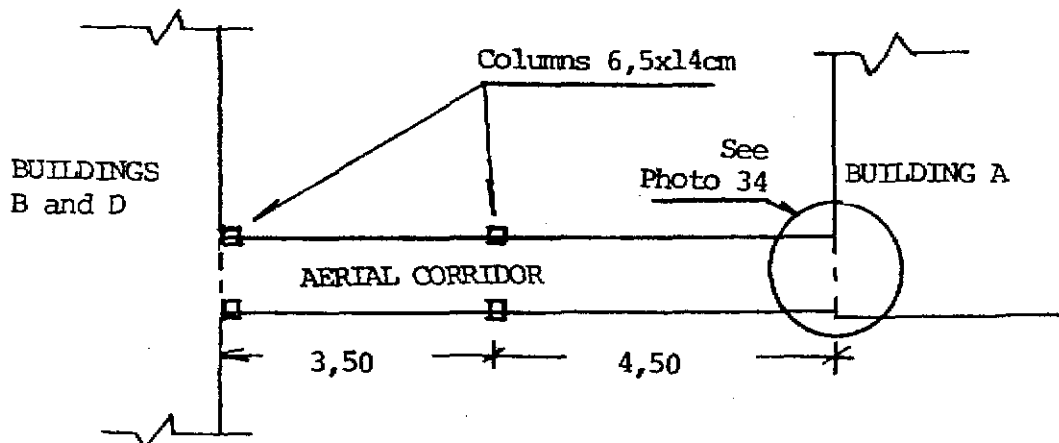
LAYOUT OF THE AERIAL CORRIDOR BETWEEN BUILDINGS A AND B-D
